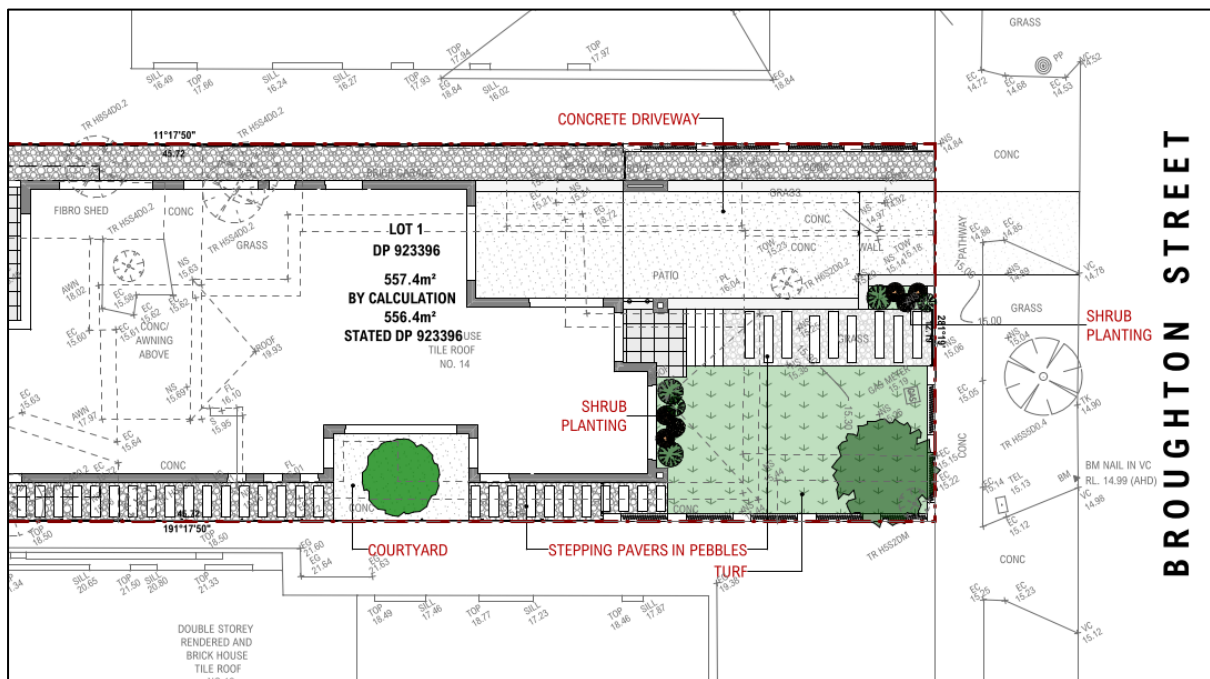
Original proposal siting behind prevailing front building line of existing dwellings in the streetscape.
